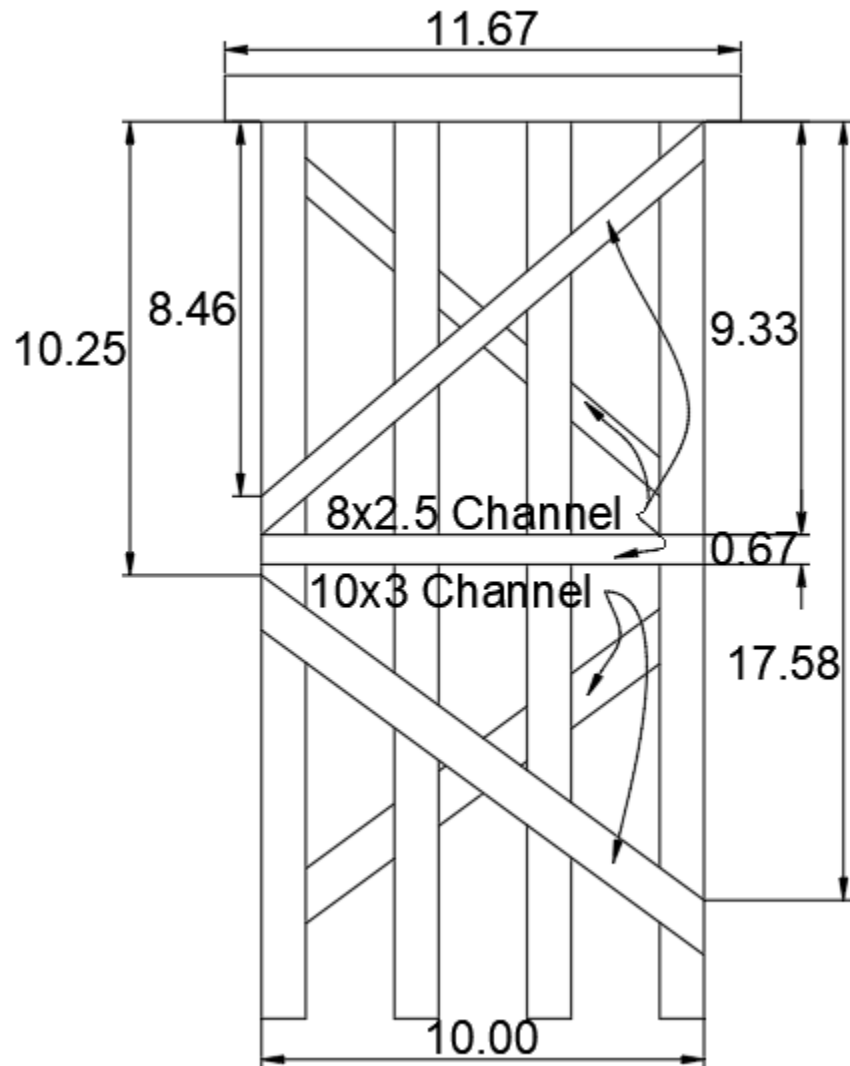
Detail of the spur bridge Pier 4 (pier closest to the centerline of the channel) on the right bank.
